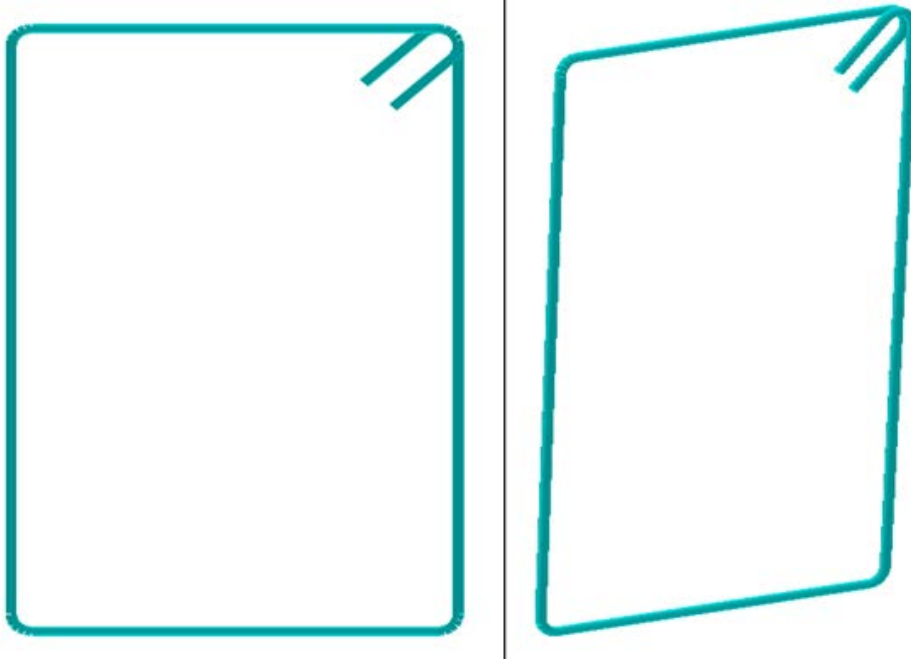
3D View of CRSI Rebar Bend Type -T1 used in modeling
